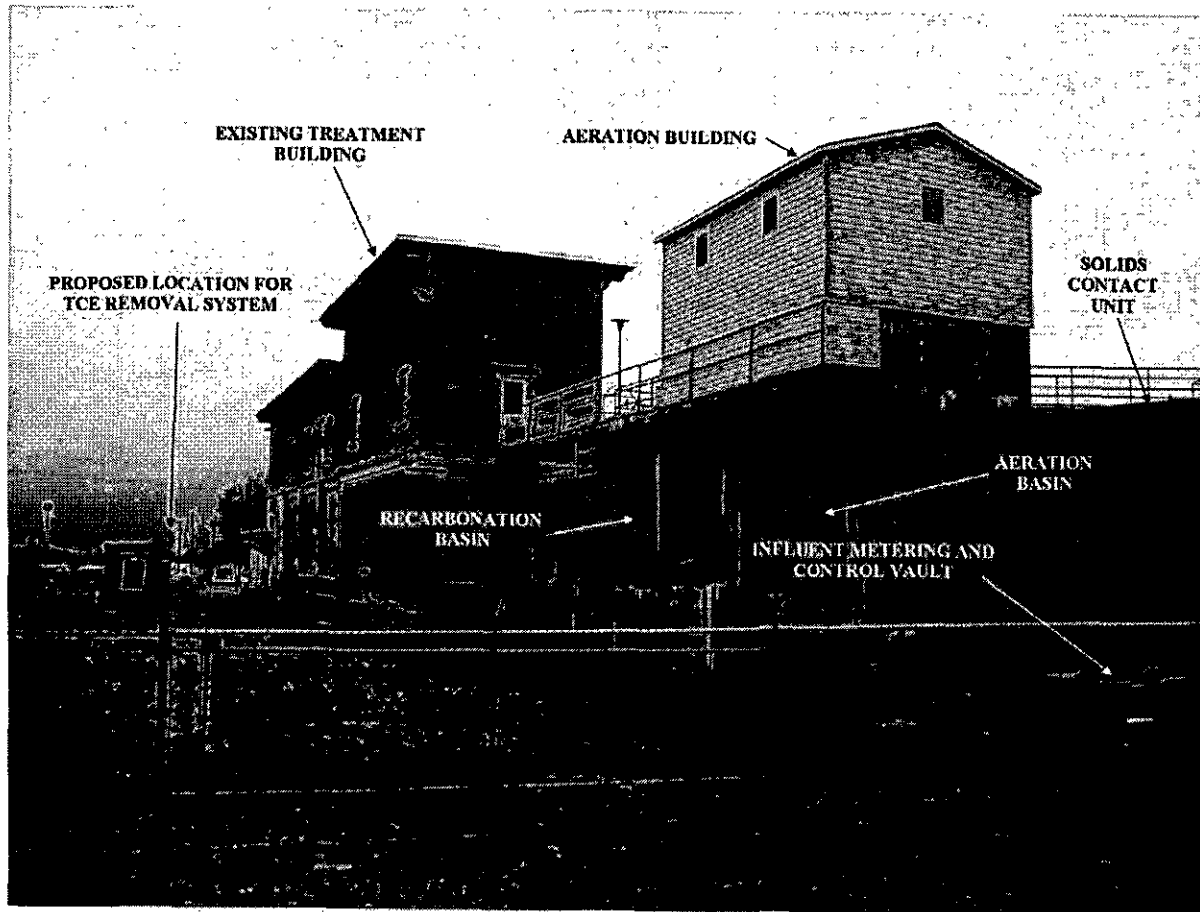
Proposed Location of Air Stripper TCE Removal Units
